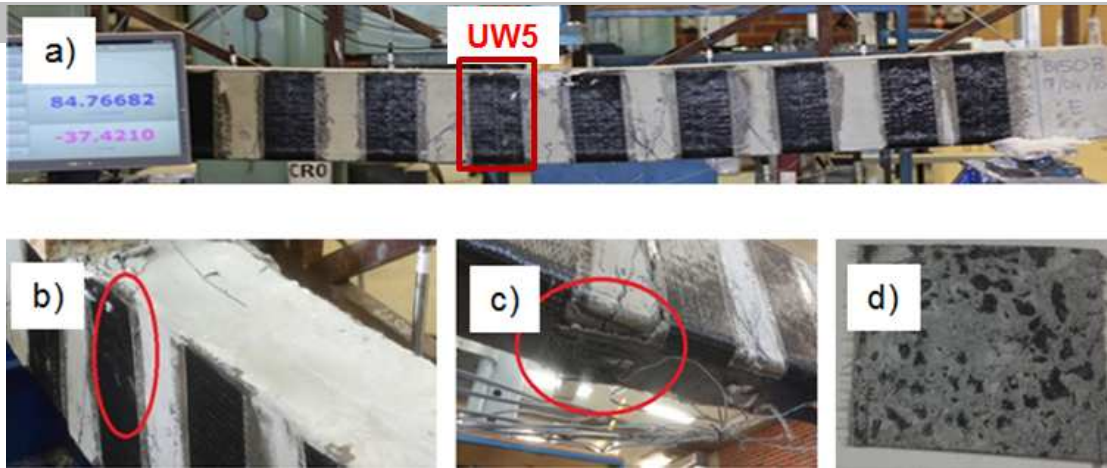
(a) Failure mode of Beam B150B; (b) U-jacket debonding; (c) Rupture of the soffit strip; (d) BFRP/Concrete interfacial failure of U-jacket UW5
